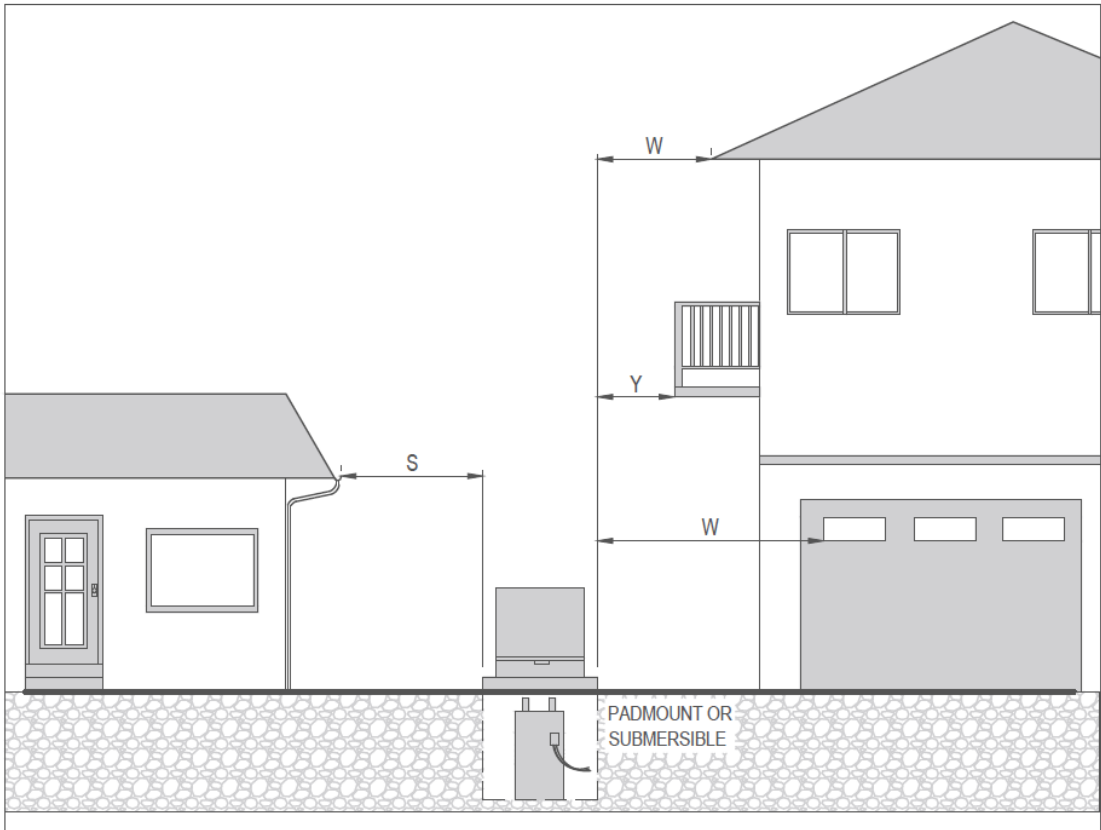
Minimum Clearances of Oil-Filled Transformers from Buildings (STD-D-3207)
